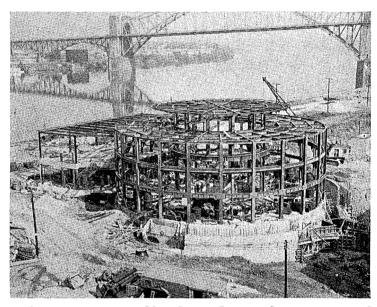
STRUCTURAL STEEL FOR MAIN SEWAGE PUMPING STATION IN PLACE, CONTROL BUILDING PORTION TO THE LEFT WITH CIRCULAR WET AND DRY WELLS ON THE RIGHT, CONCRETE WORK IN THE LOWER RIGHT FOR DISCHARGE CONDUIT TO REMAINDER OF PLANT. MCKEES ROCKS BRIDGE ACROSS OHIO RIVER IN BACKGROUND.
